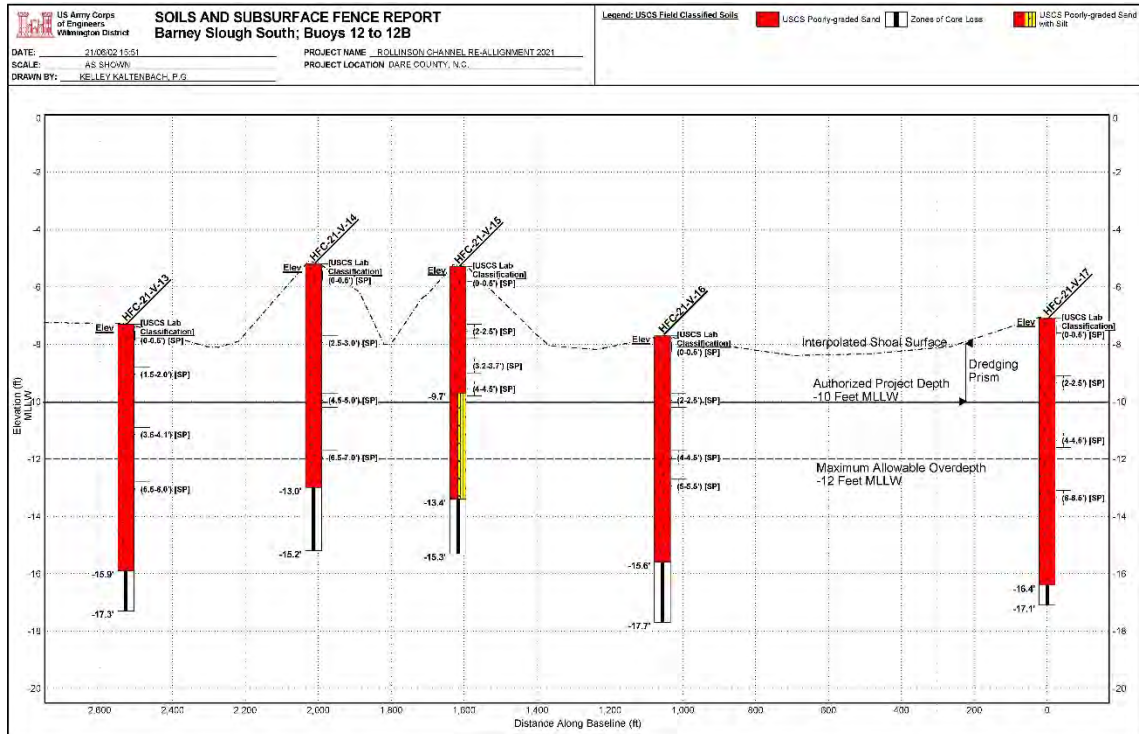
Figure 16. Fence cross-section, borings in Barney Slough Channel South.
